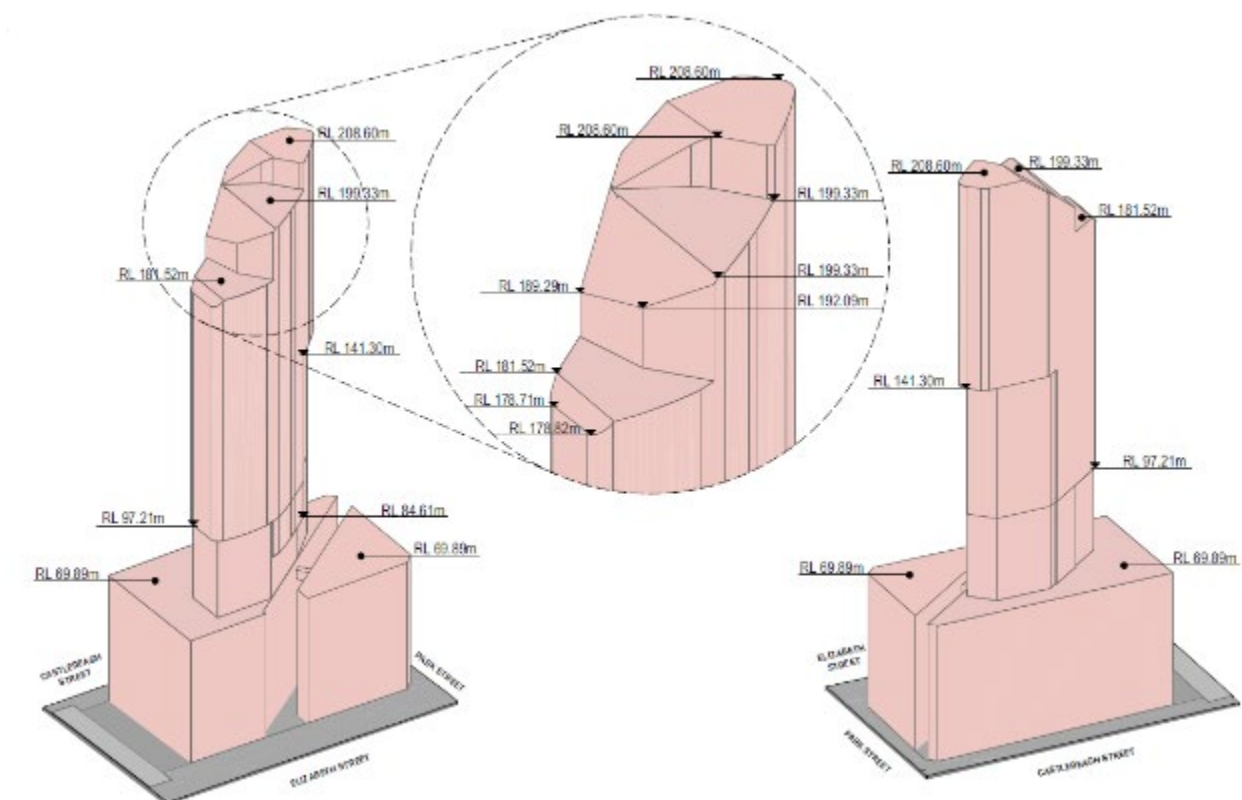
| Proposed axonometric diagrams (Source: Ethos Urban modification plans)
